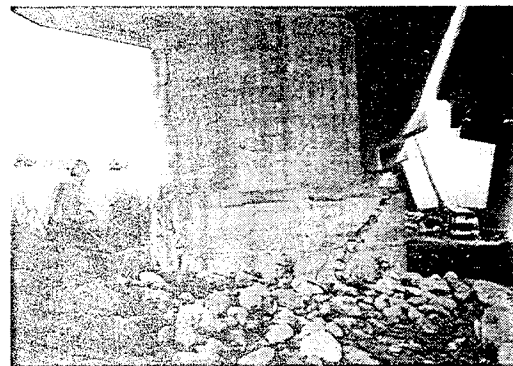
Failure of Caisson Foundation as a Direct Fault Movement, Wu-Shi Bridge (Courtesy of S. Iwata)
